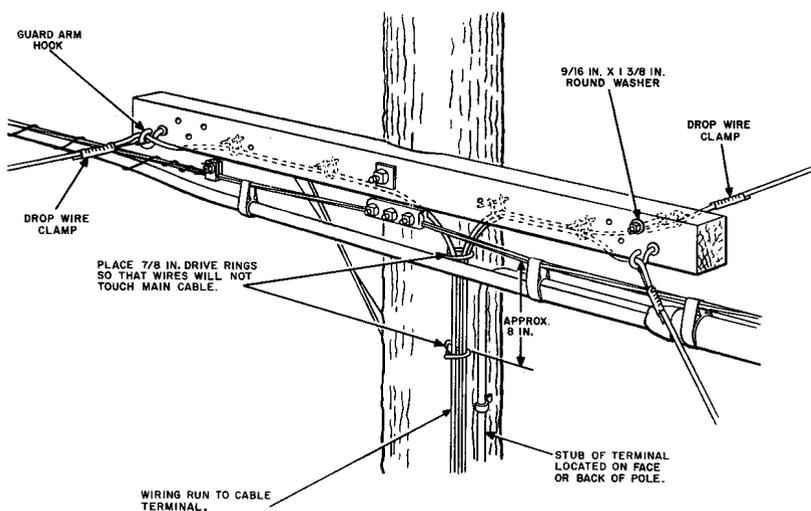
Cable Terminal Mounted on Face or Back of Pole
